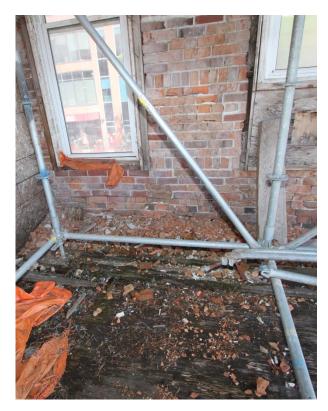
Substantial spalling of the interior face of the brick exposed to the sun during the winter months
